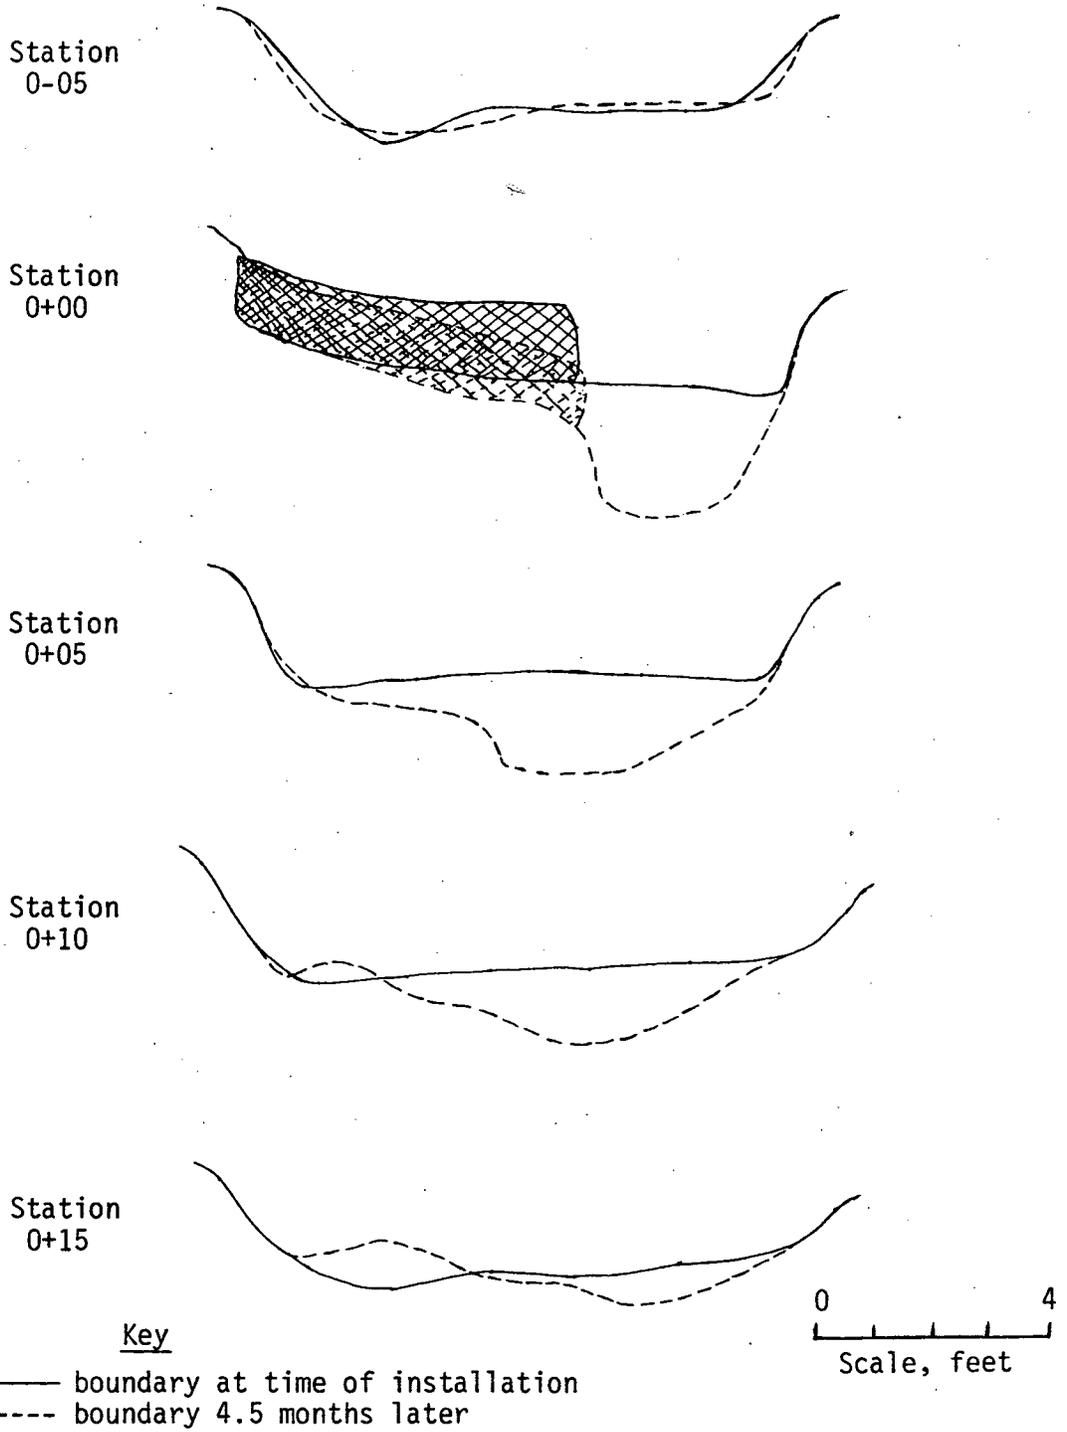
Oak Creek Cross Sections Immediately After Gabion Groin Installation and Four and One-Half Months Later
